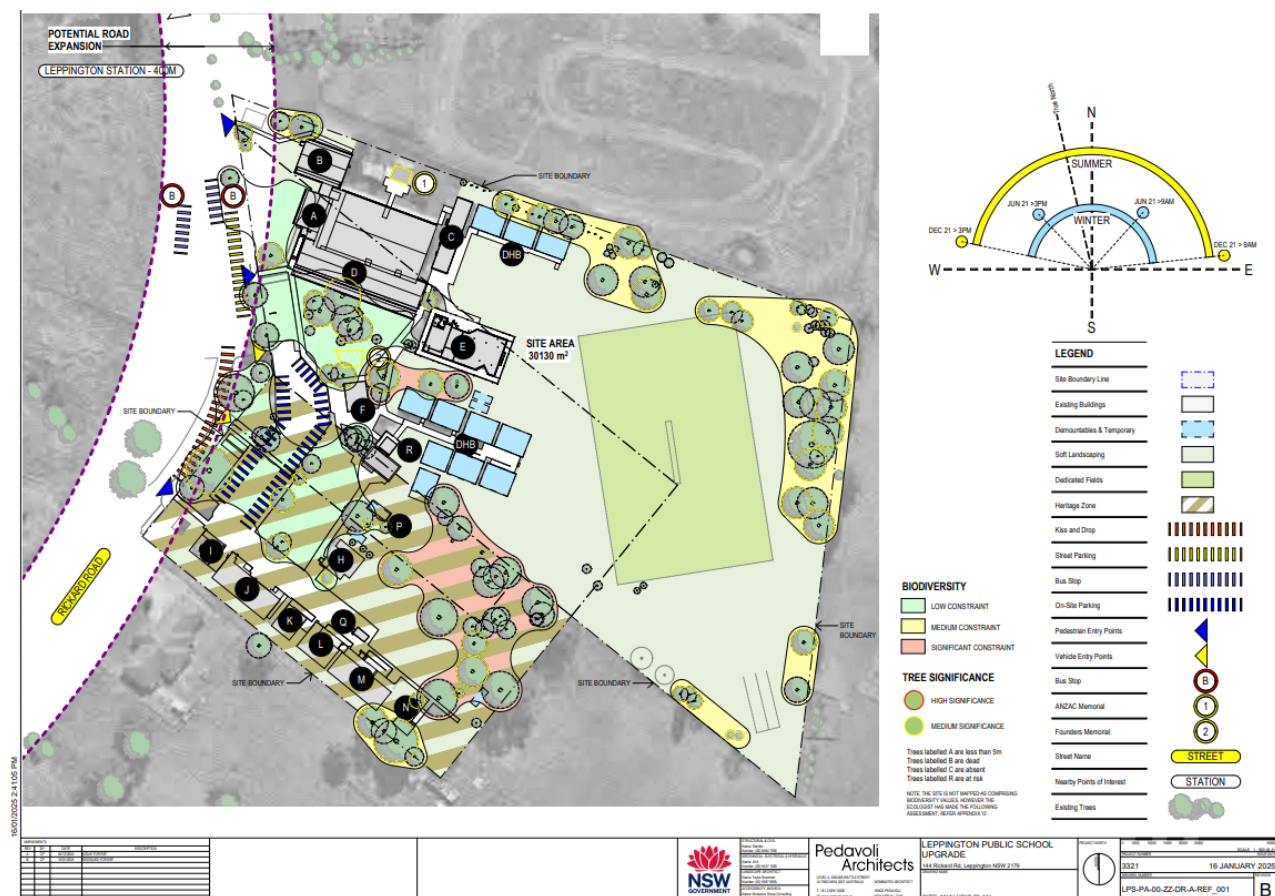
PROPOSED ACTIVITY (SOURCE: PEDAVOLI ARCHITECTS, OVERALL SITE PLAN)
